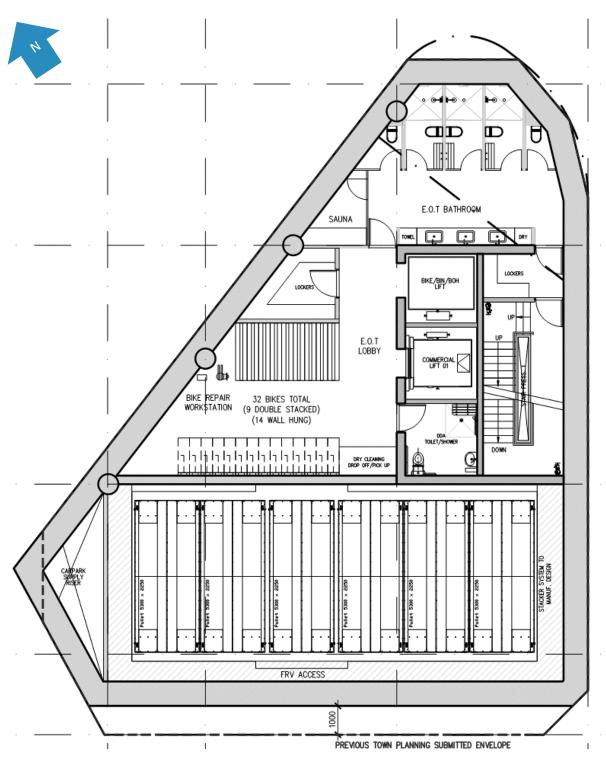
Proposed Floor Plans – Basement 2 (Image Source: Elenberg Fraser)
